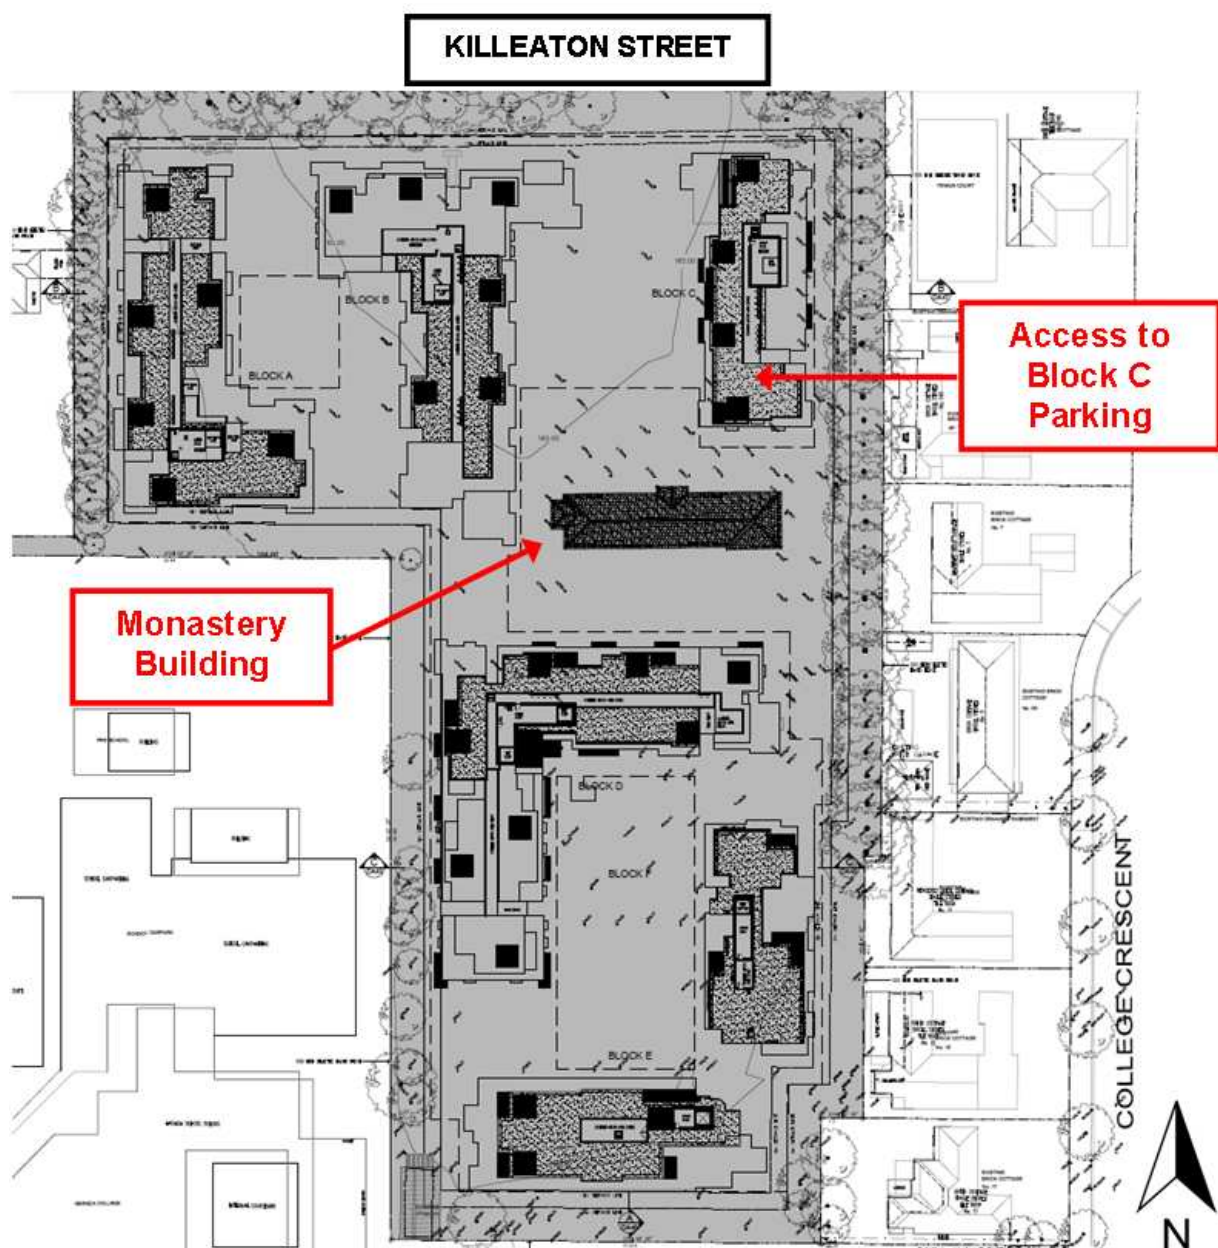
Site Plan demonstrating the location of the existing Monastery building and the lift access to the parking levels via Block C.
